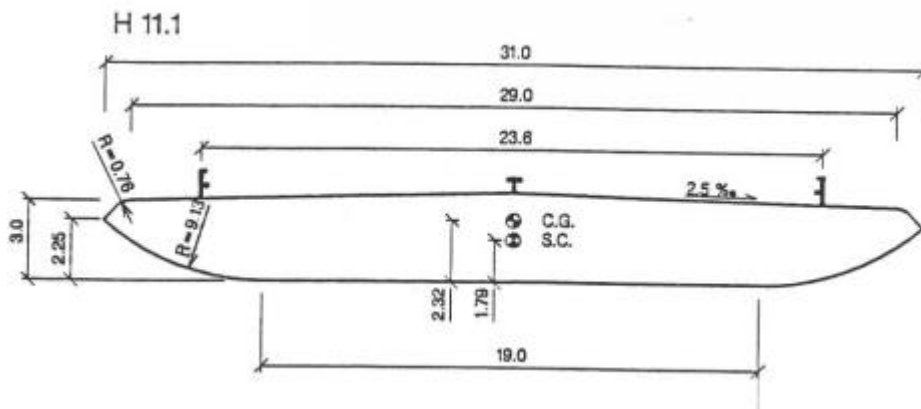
Alternative H11.1 deck section, suspension bridge, Storebælt East Bridge.
